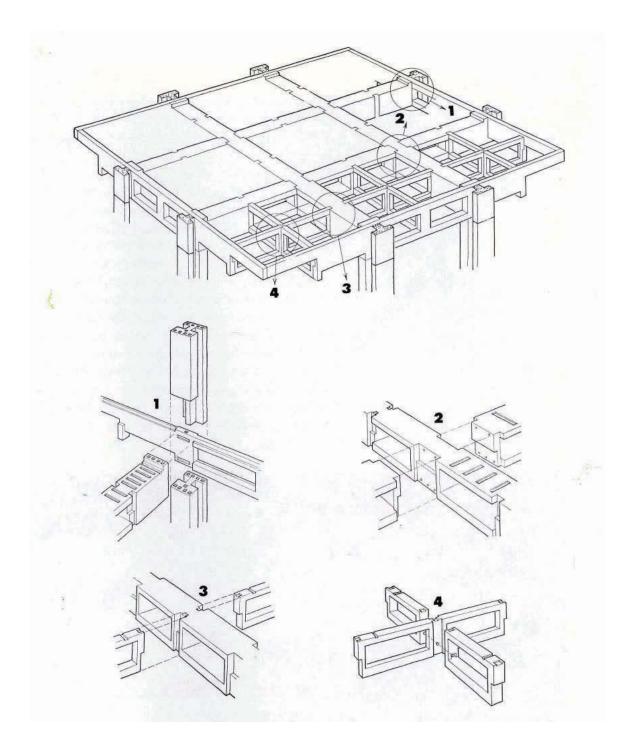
Model of the precast structure showing different types of connection. (Komendant, 1975)
